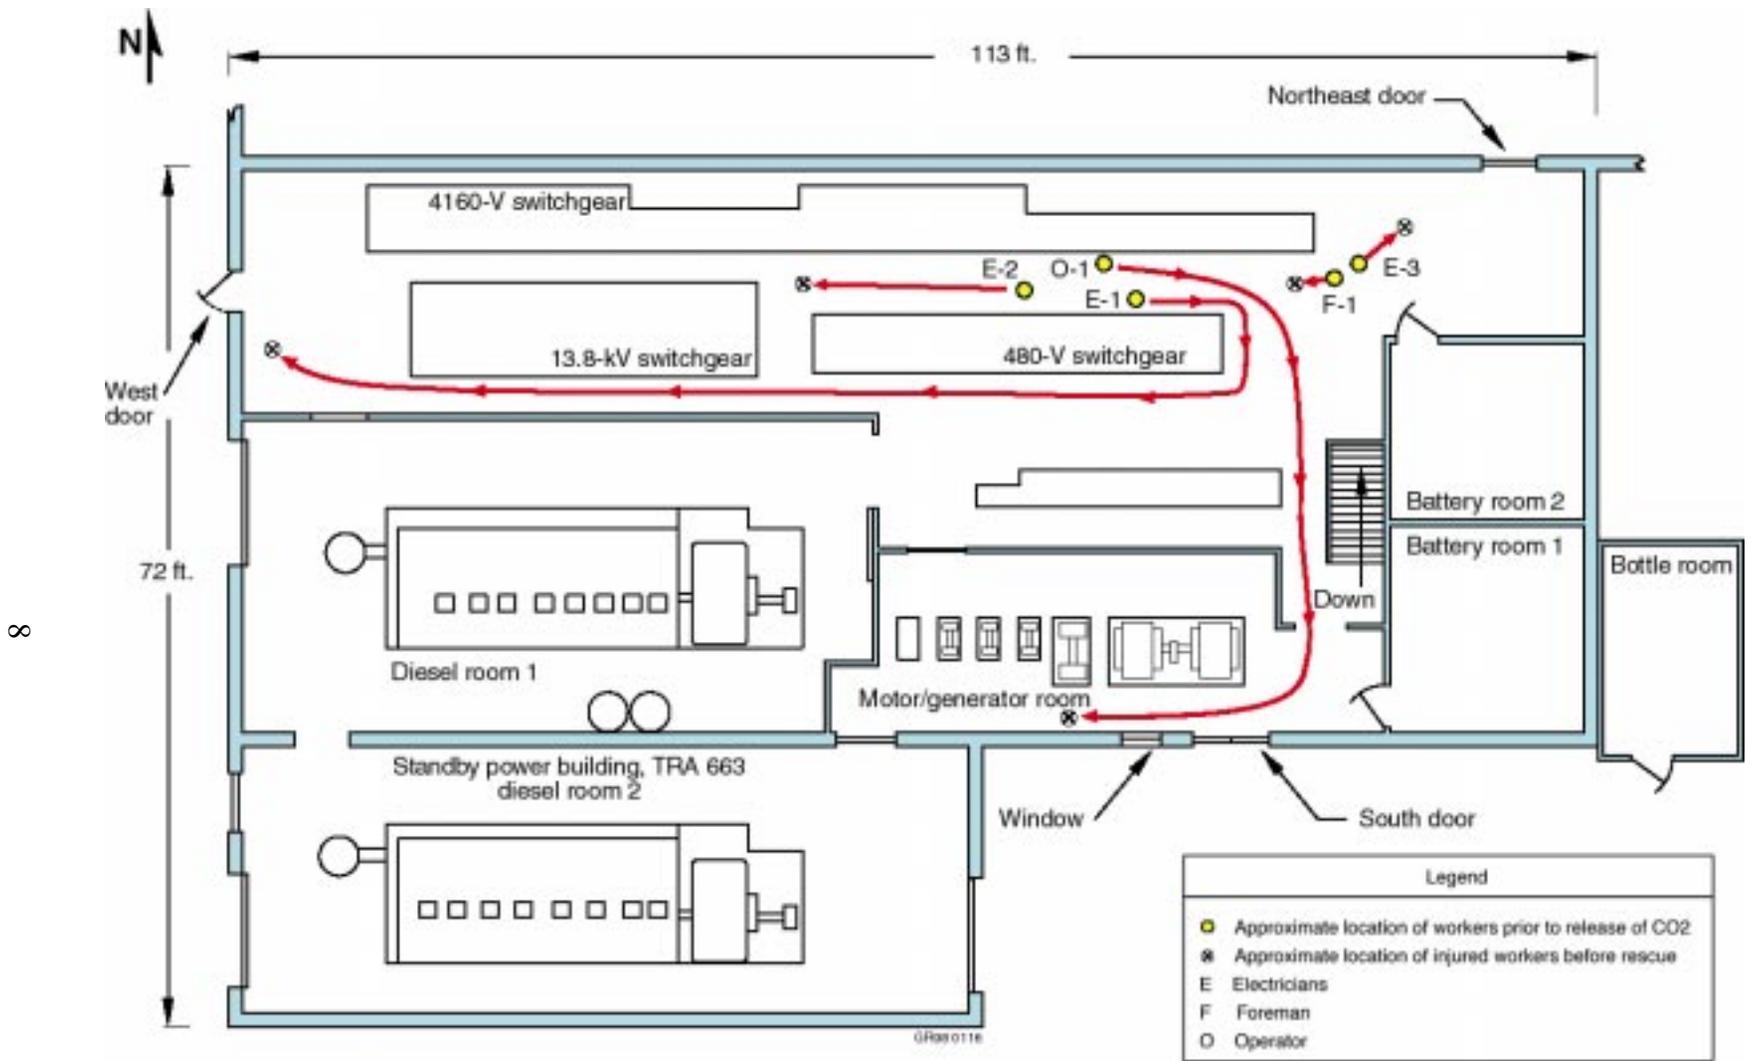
Building 648 Layout with Escape Routes of Five Injured Workers
